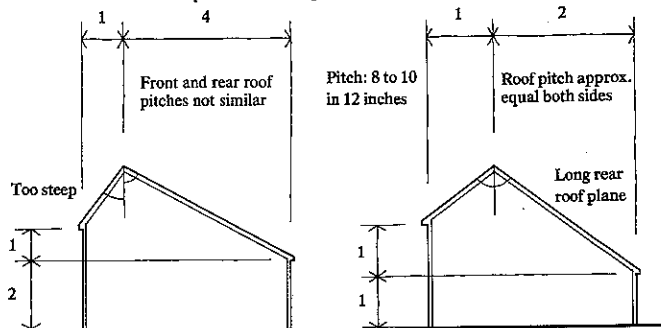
An incorrect lean-to roof and a proper lean-to shape.
